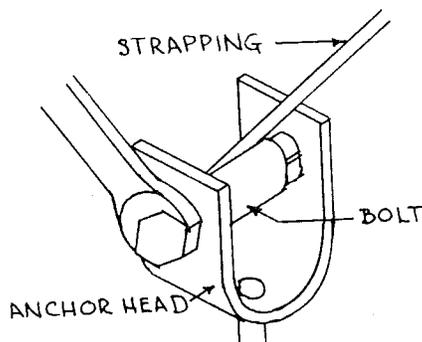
Tension bolt in anchor head, with strapping inserted and wrapped ready for final tightening.
